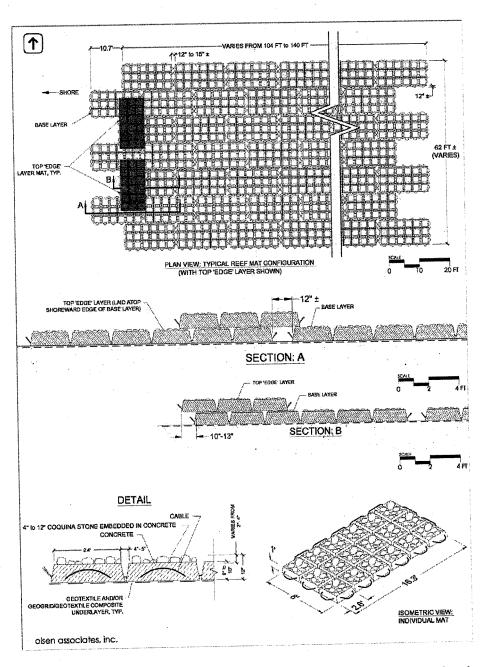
Plan and elevation view of typical articulated artificial reef-mat mitigation structure.
